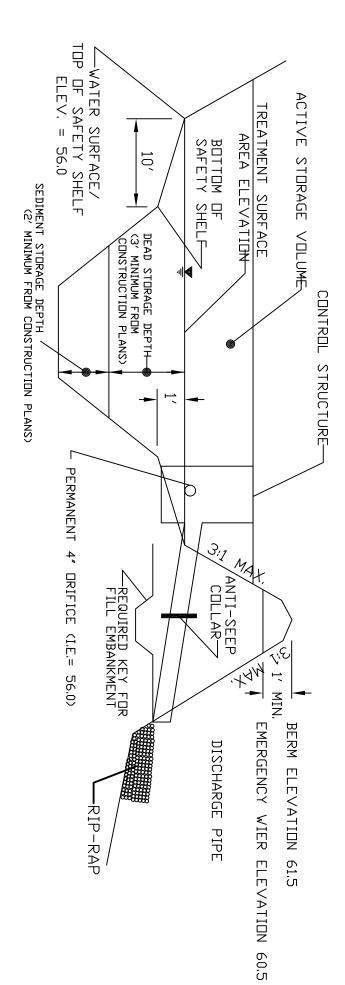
EXHIBIT E - CROSS SECTION WET-POND AS-BUILT
